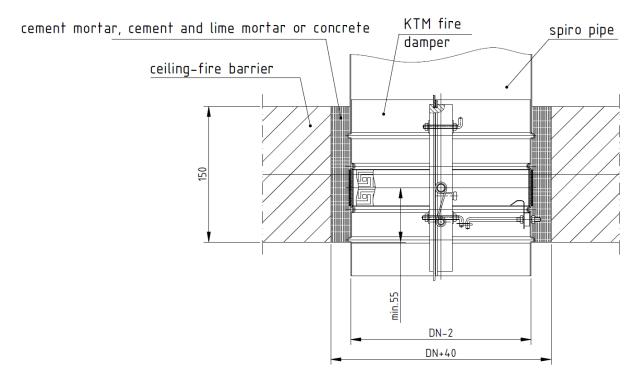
Installation of KTM fire damper (male coupling) in rigid ceiling barrier
